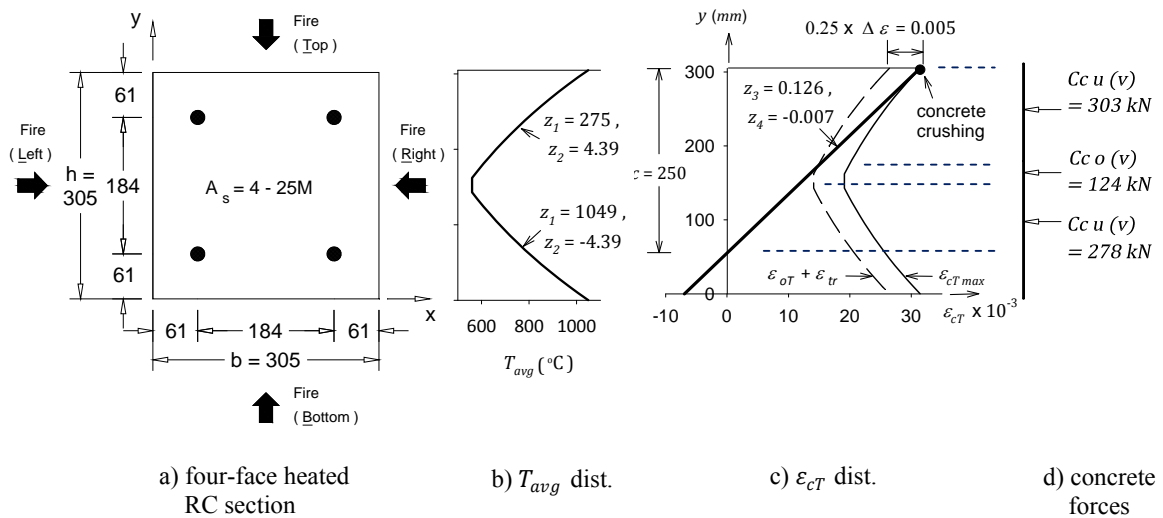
Concrete internal compression force for Lie and Woollerton3 column
